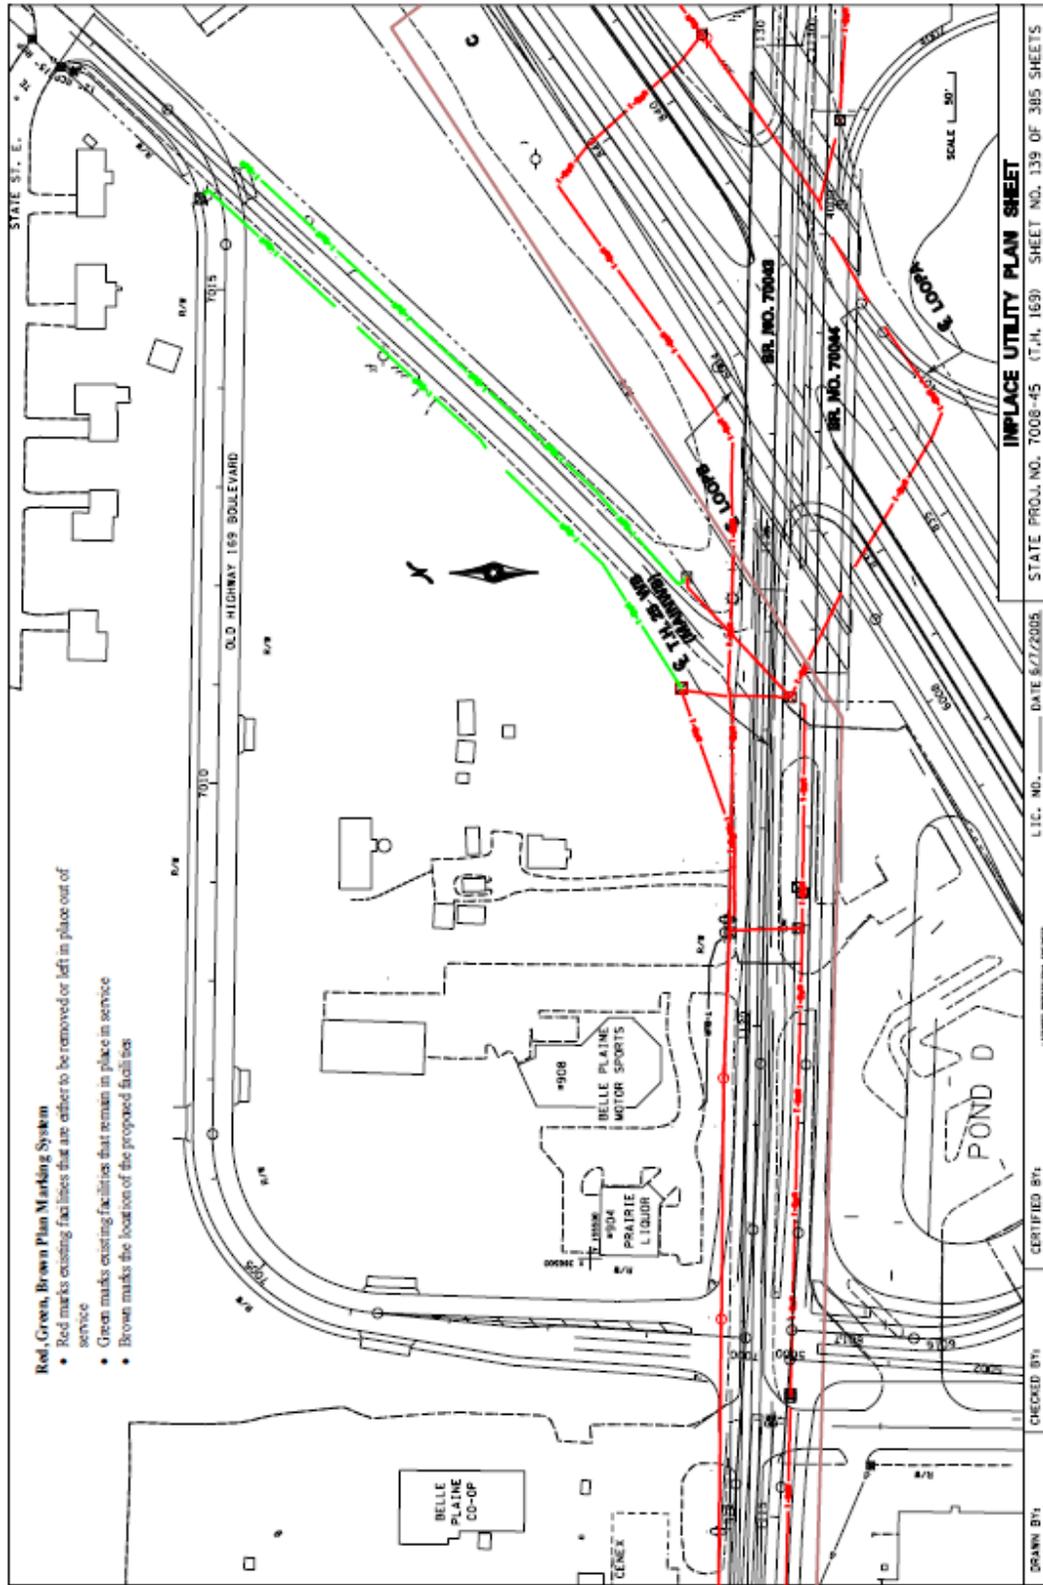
Mn/DOT Red, Green, Brown Plan Marking System Example
